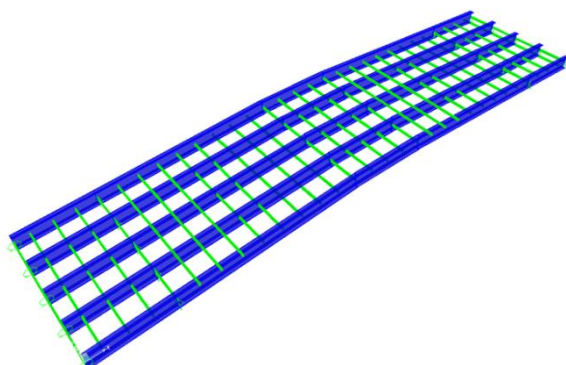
Steel structural system design model (blue for main beam, green for joists)
